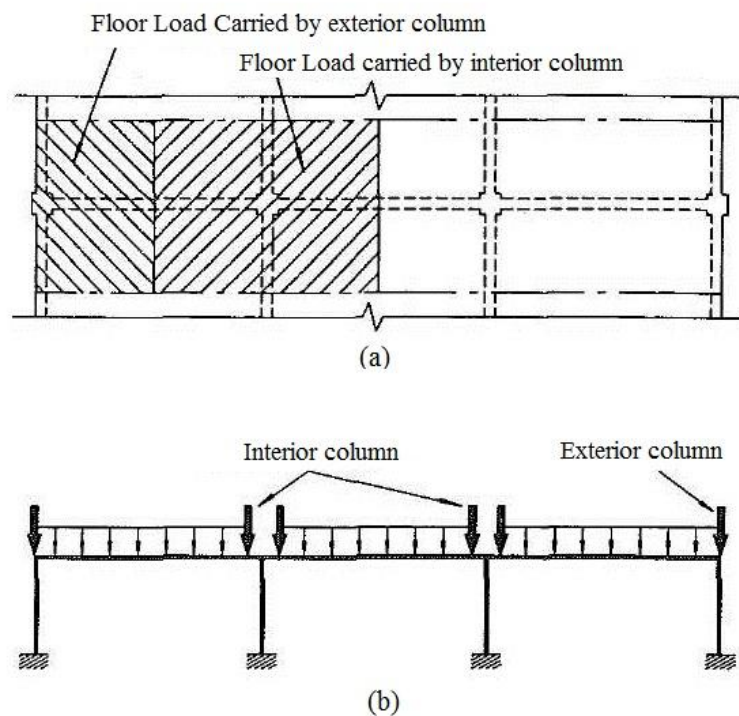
Column Loads transferred from floors: (a) Floors; (b) Frame.
